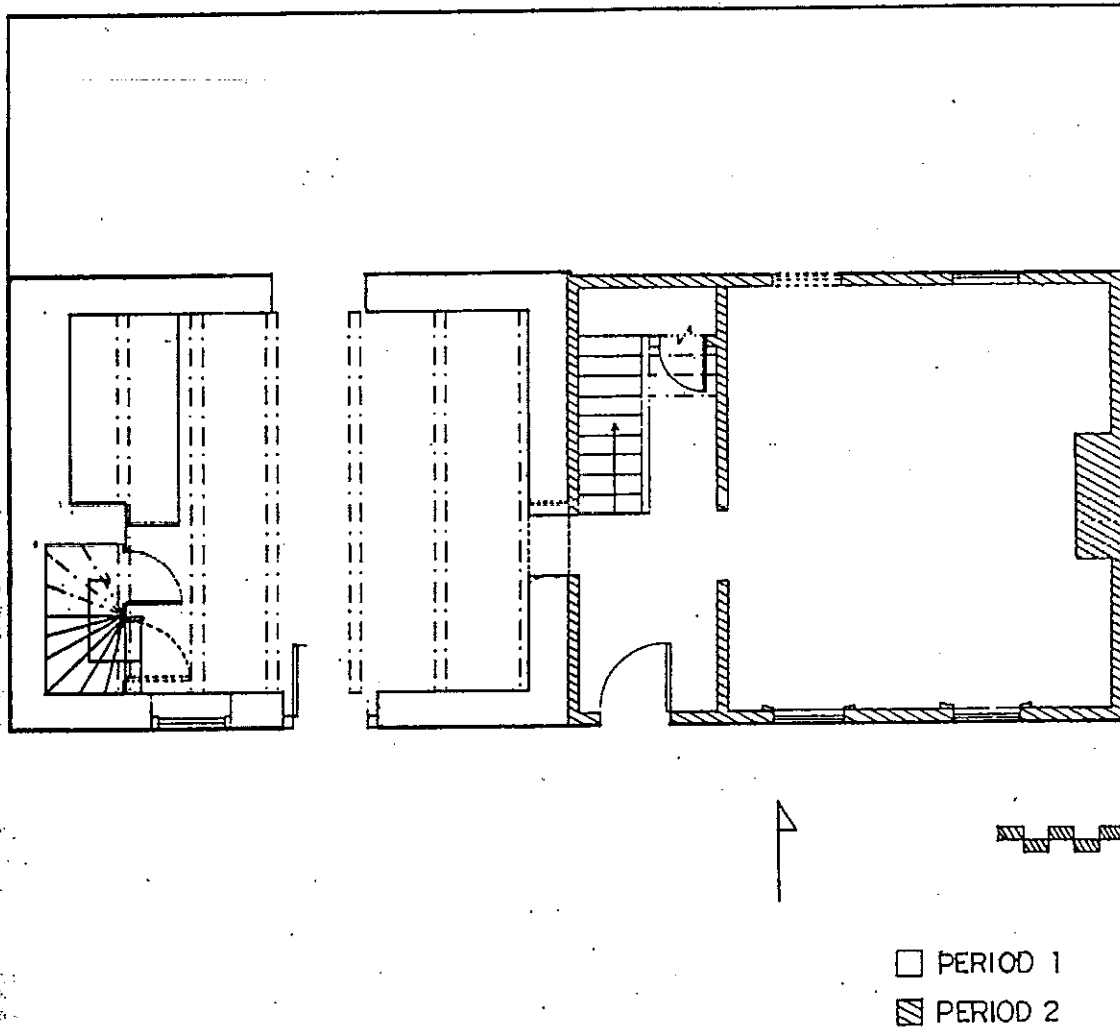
Plan, Job Phillips House. Plan of the first floor. (Drawing, author)
